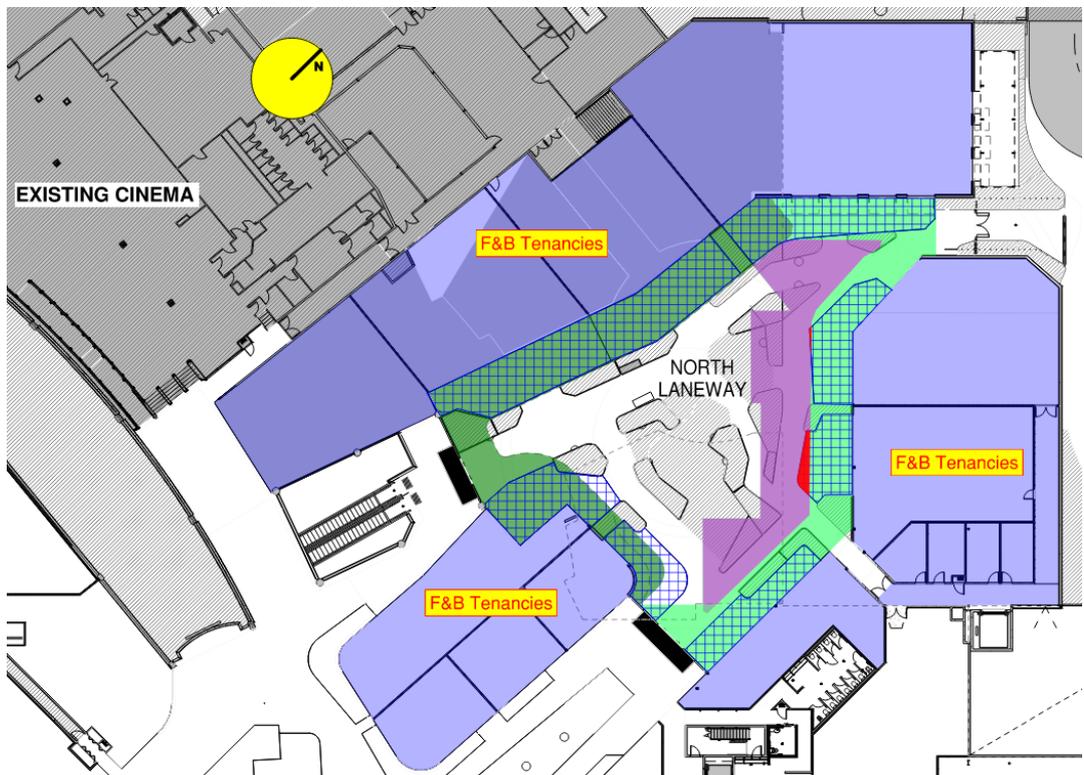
North Laneway layout and extent of sprinkler protection to canopies
